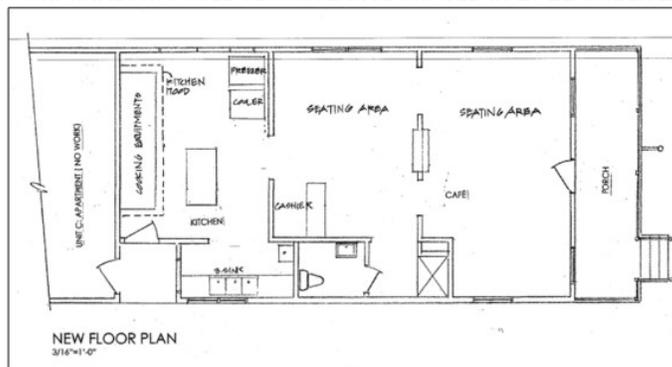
ORIGINAL PROPOSED FLOOR PLAN APPROVED IN 2021 UNDER ZD001-21¹
